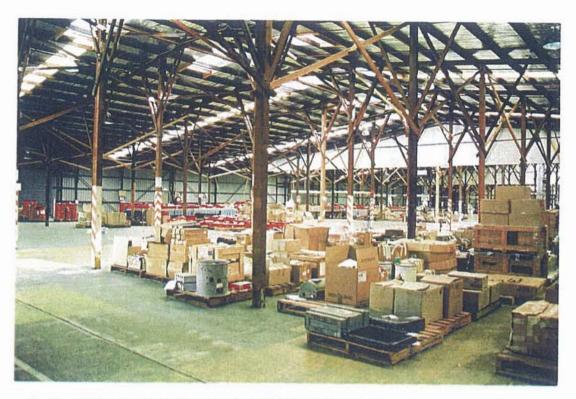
TYPICAL INTERIOR OF A WORLD WAR II TIMBER POST AND BEAM STORE BUILDING AT DNSDC MOOREBANK
